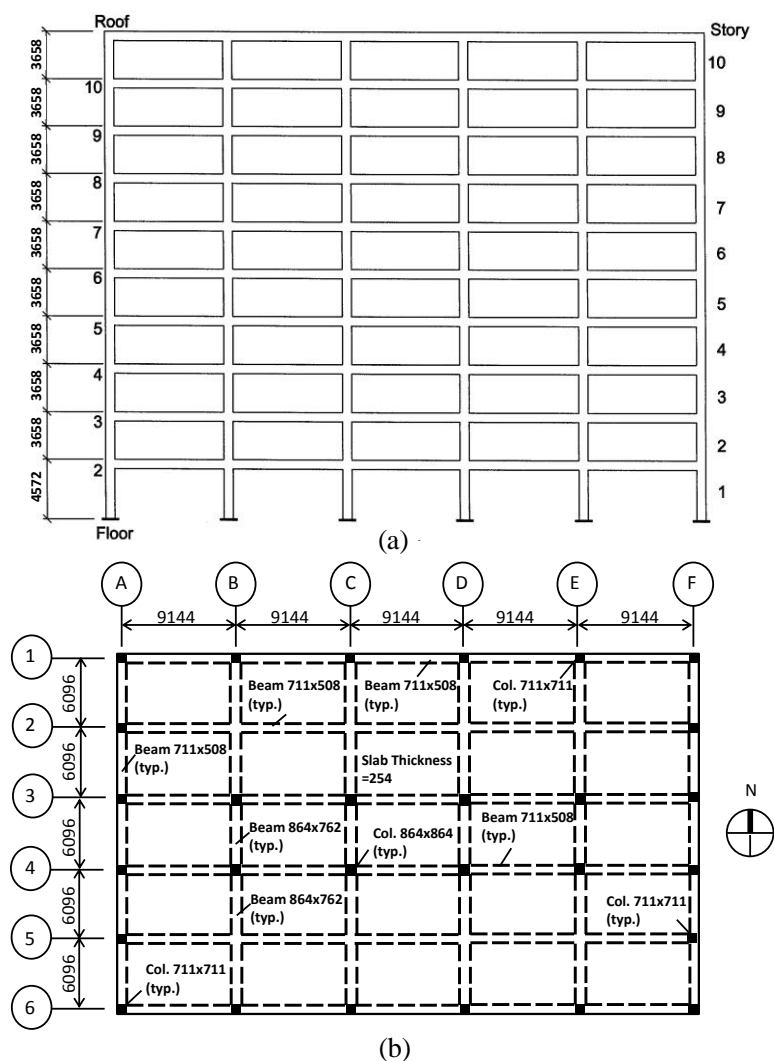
Prototype concrete frame building: (a) elevation view and (b) plan view.
